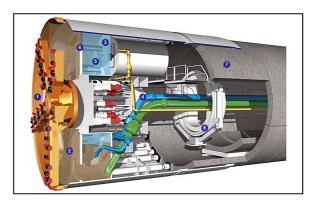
Typical Slurry-Face TBM with Precast Segment Lining
